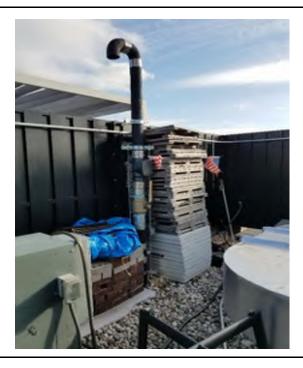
V5 riser in good condition, facing southeast. 27 February 2019.
